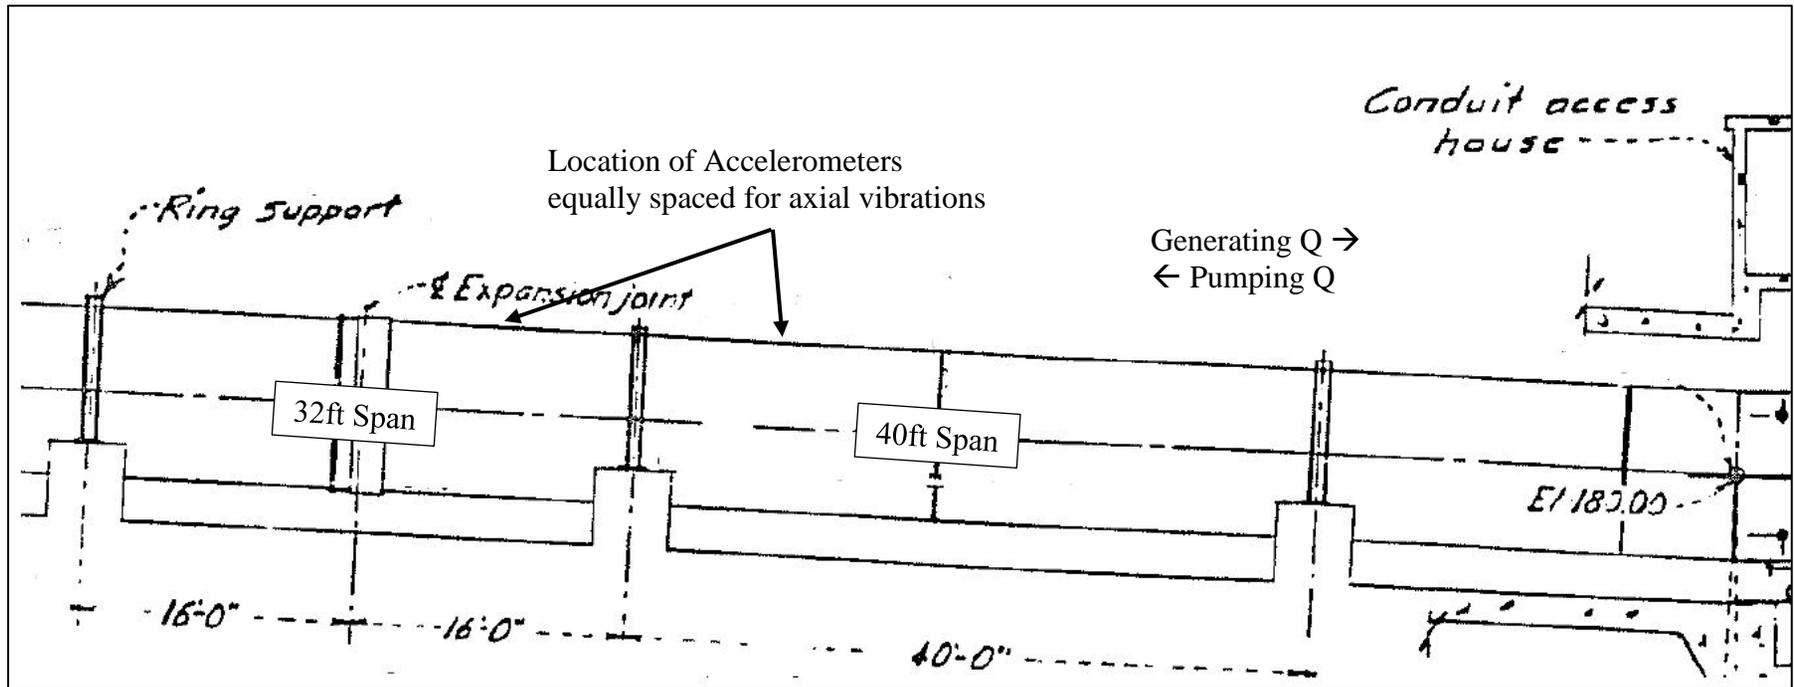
Drawing of Senator Wash Penstock showing 32-ft span (with expansion joint) and 40-ft span where test measurements were acquired.
